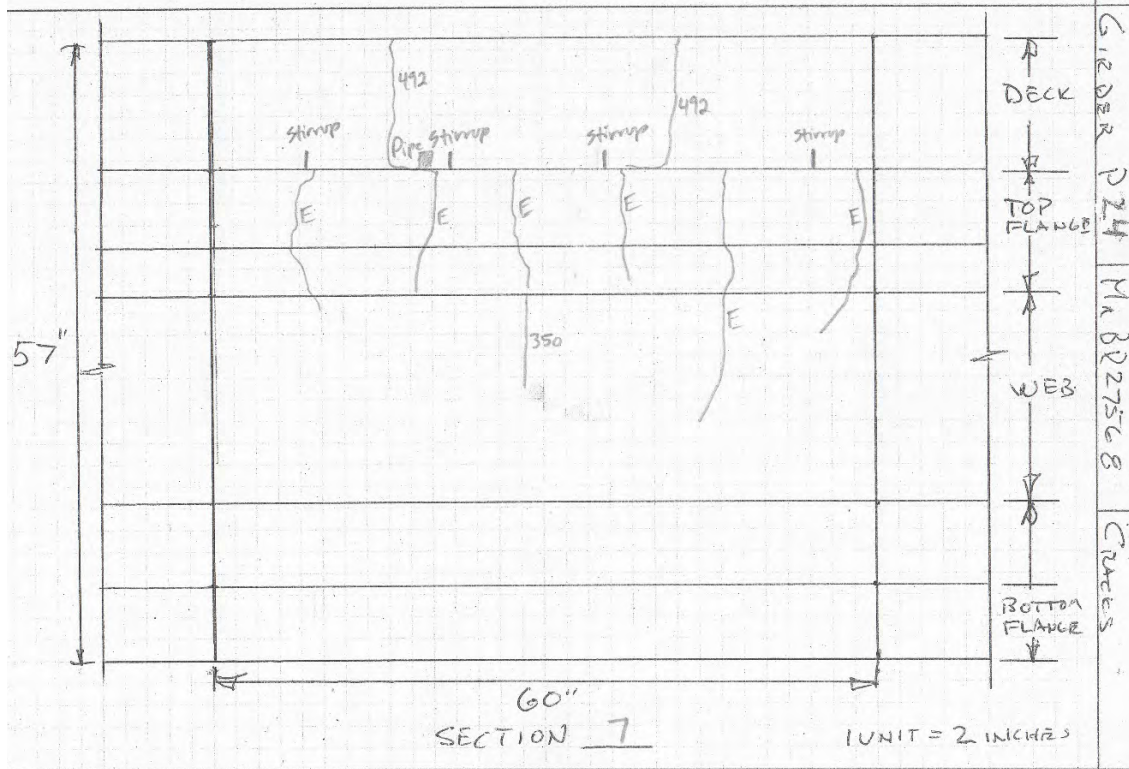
Girder P24 crack pattern – Section 7
